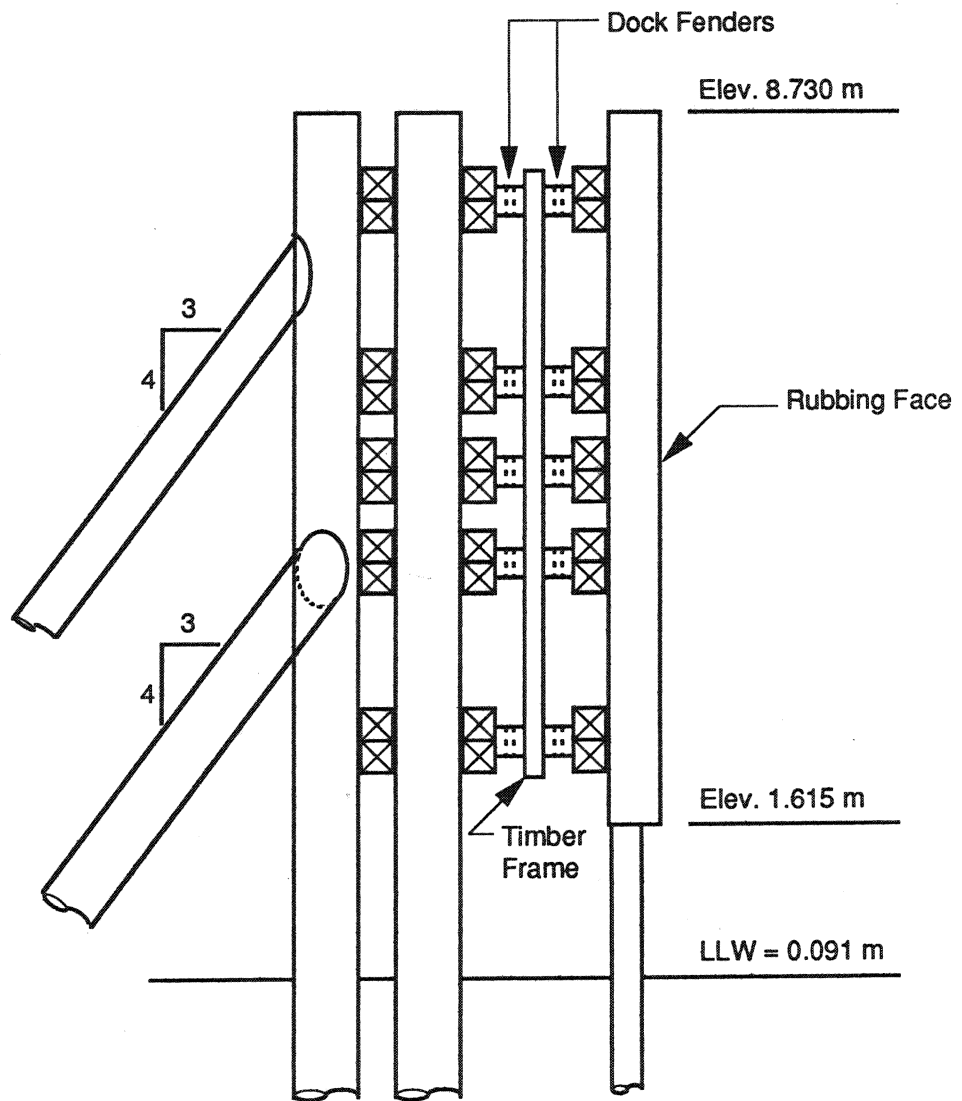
Side Elevation of West Wing Wall – Langdale Ferry Terminal
